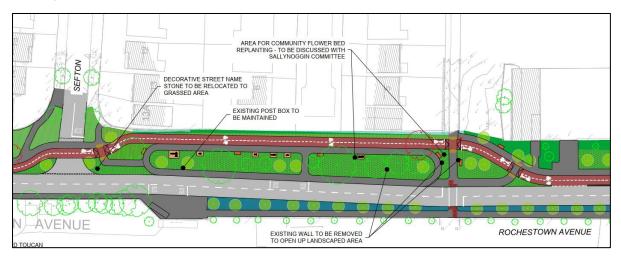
Proposed New Footpath Loop and Exercise Equipment opposite the NRH
